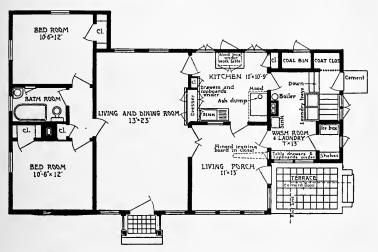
A small farmhouse arranged on a single floor, with a cellar beneath for the furnace and for vegetable storage.
